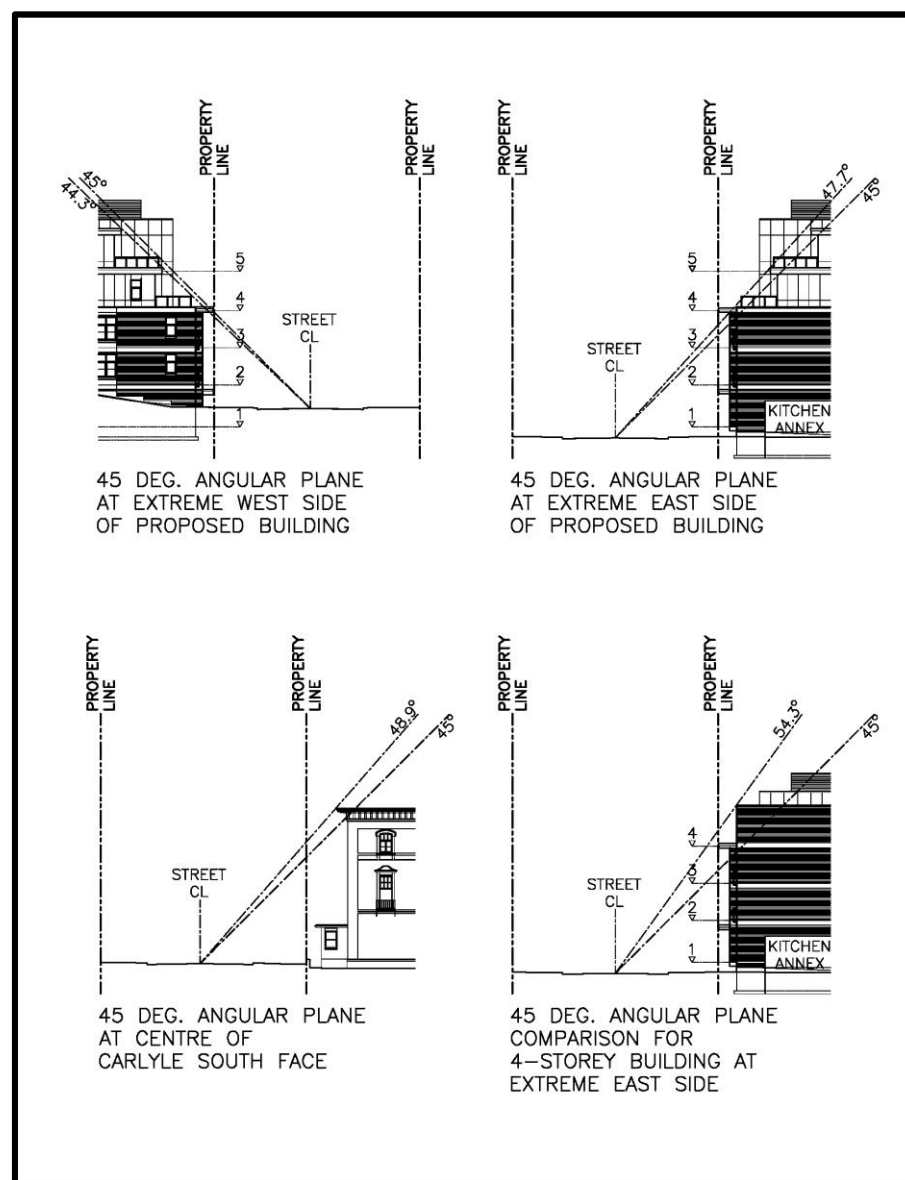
Proposed Development – Angular Plane of Proposed Design and 4-Storey Building
